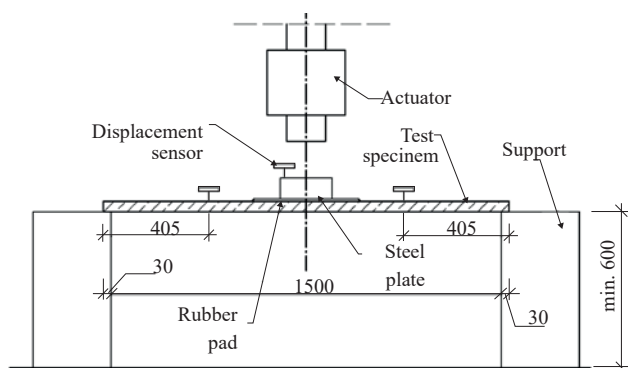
Laboratory stand for testing non-structural stay-in-place formwork panels
